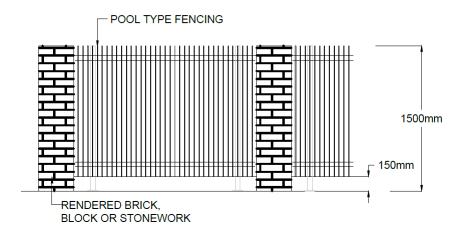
Whitlam – ongoing provisions (Elevation of Courtyard Wall)
